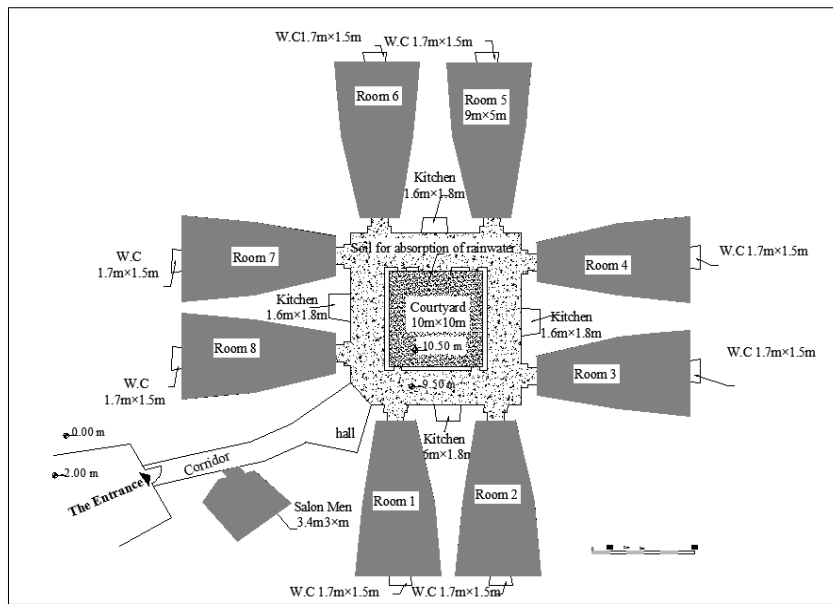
Plan of Omar Belhaj house in Gharyan.
